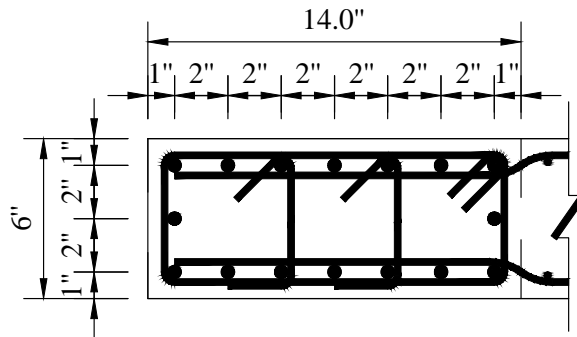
Cross-sectional view of wall pier reinforcement detail
